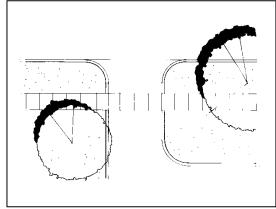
Sidewalk material continuing across driveway curb cuts when the sidewalk is at grade with the driveway.
